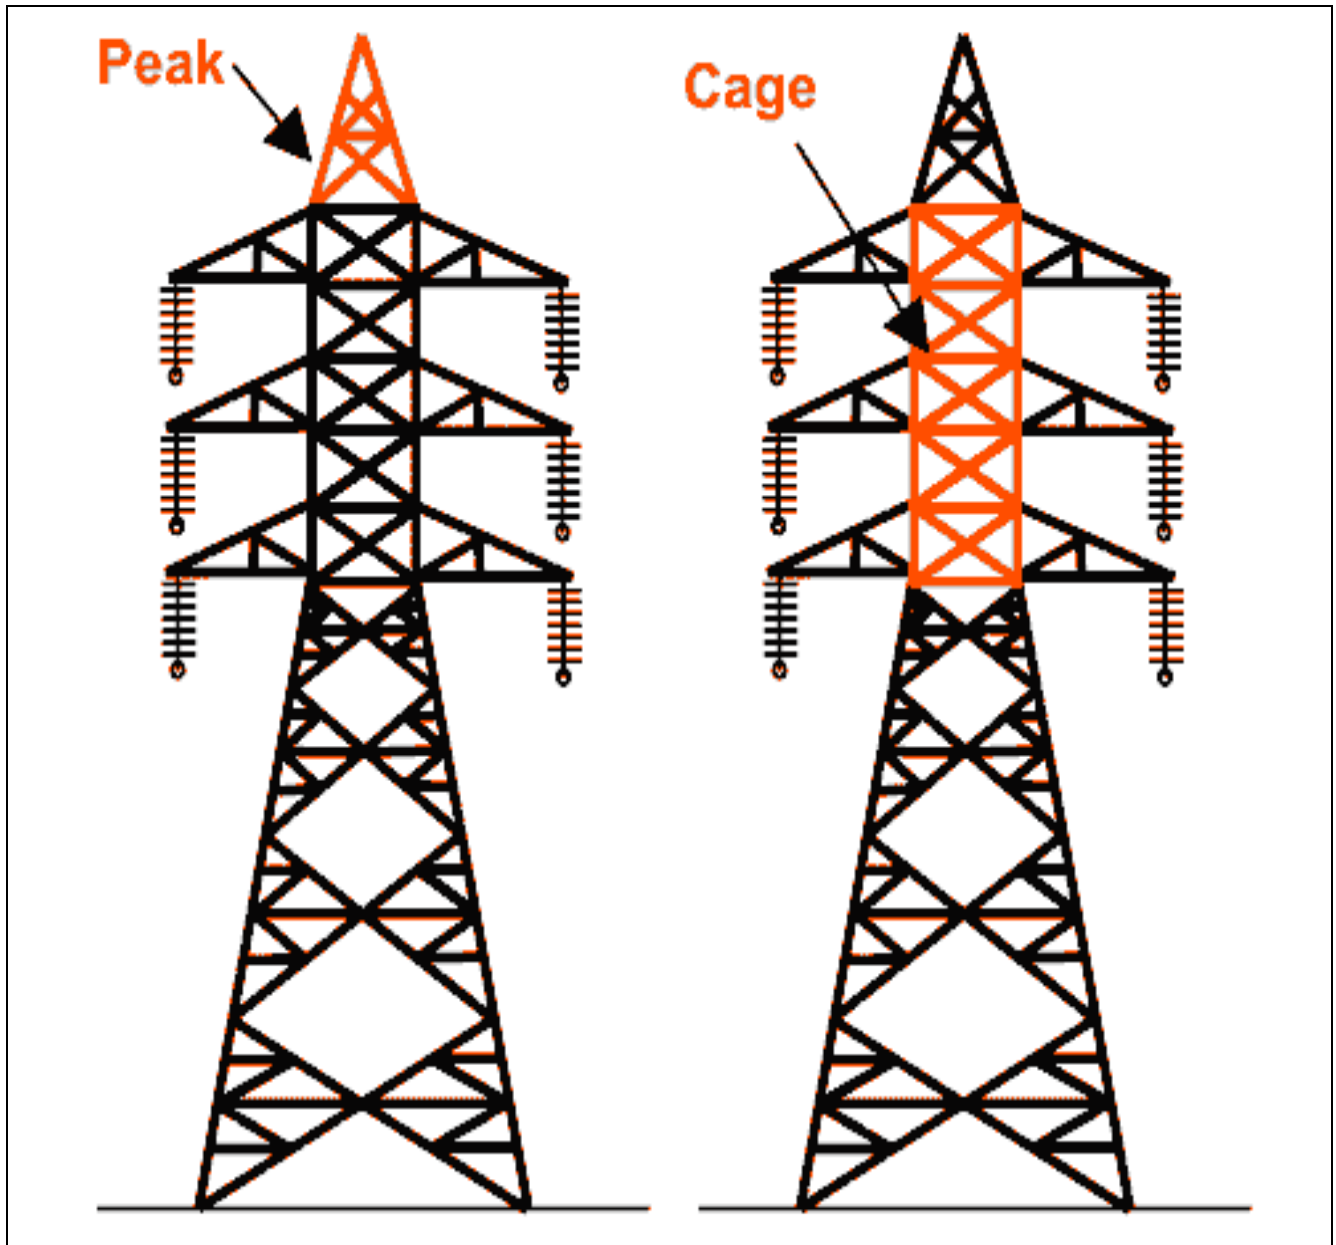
A Typical Tower arrangement for Double Circuit showing High Voltage insulations arrangement
